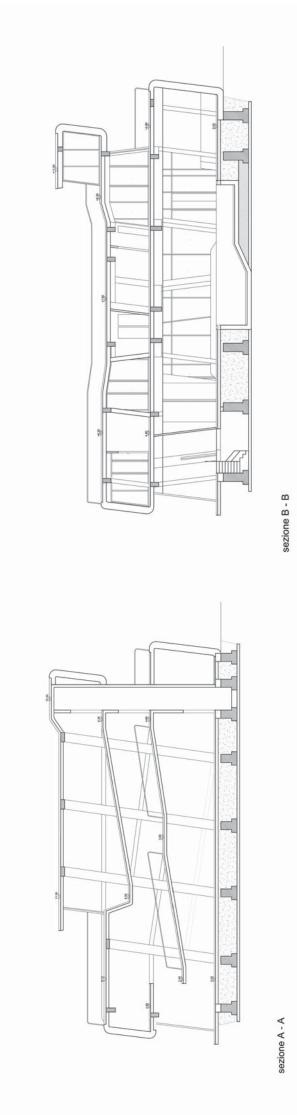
Cross sections showing raking columns and specially designed anti-seismic dampers for the foundations
